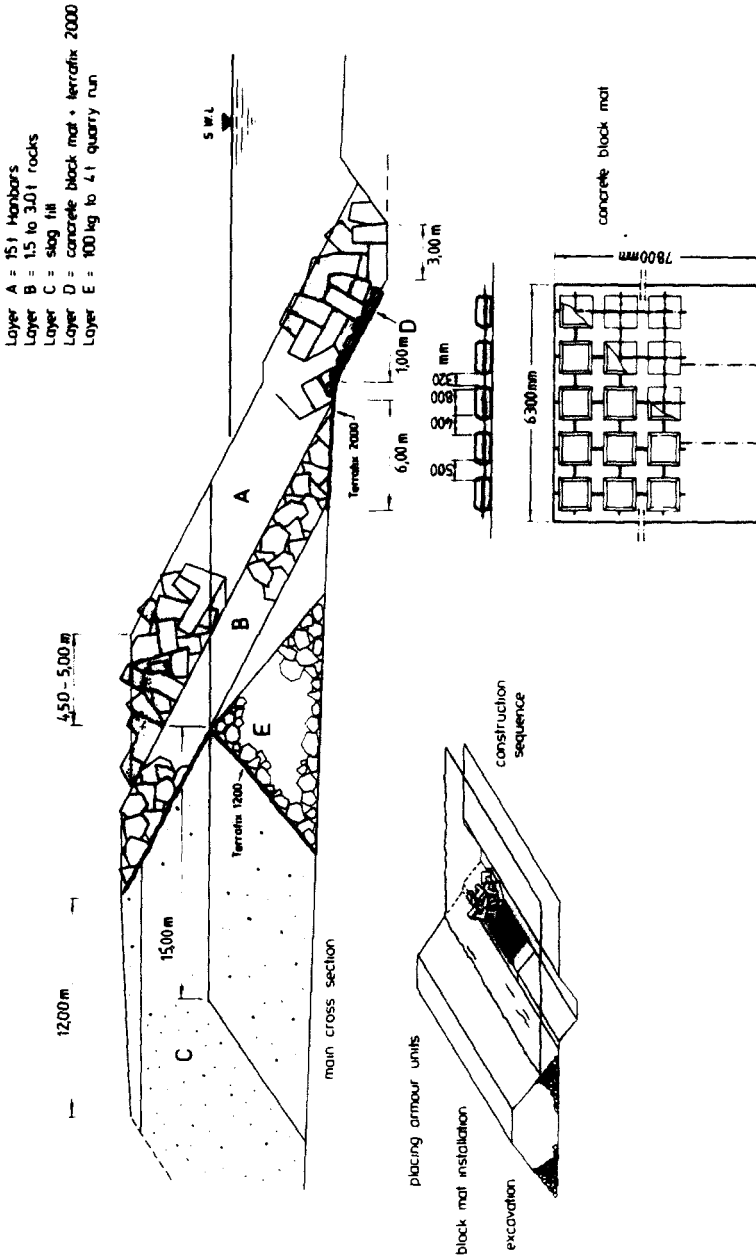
Port Kembla Seawall, Australia: construction details, SWL = sea water level.
